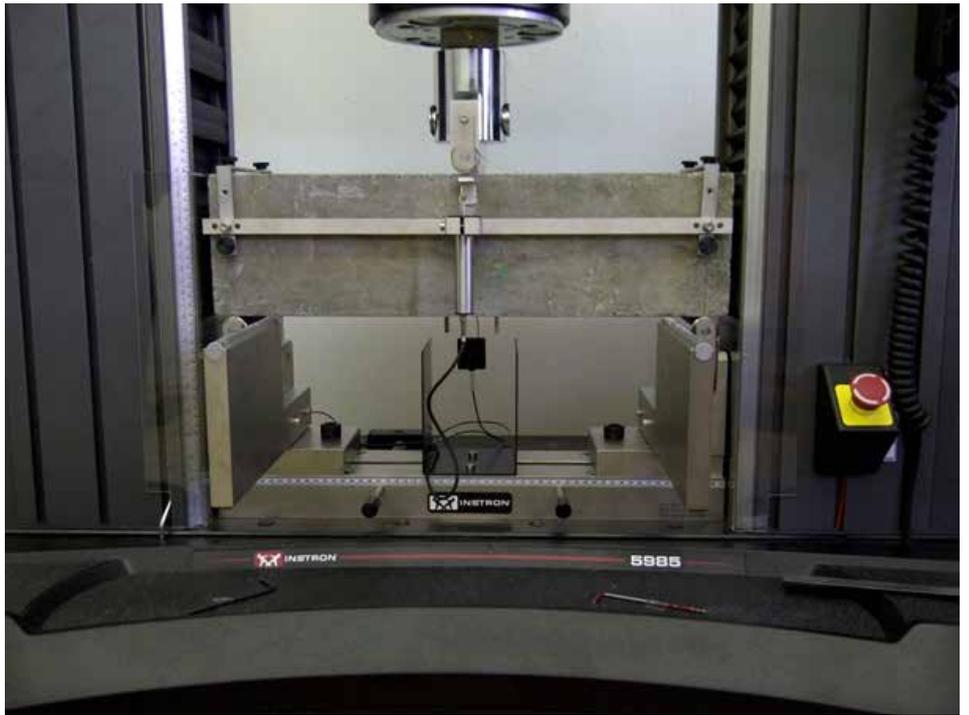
Beam test setup to EN 14651 with CMOD gauge and additional LVDT for displacement measurement.
